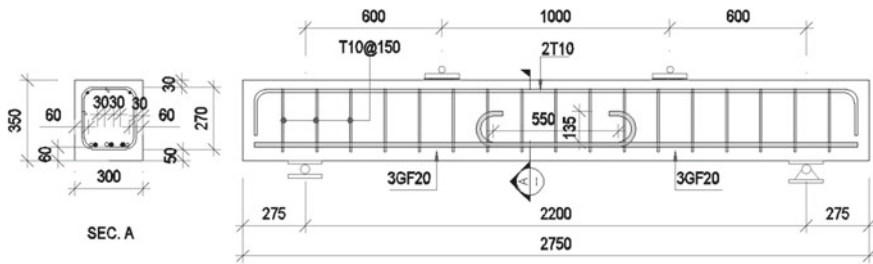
Reinforcement details of beam specimens with 180° hooked-end bar lap splices (HL-01 and HL-02)
